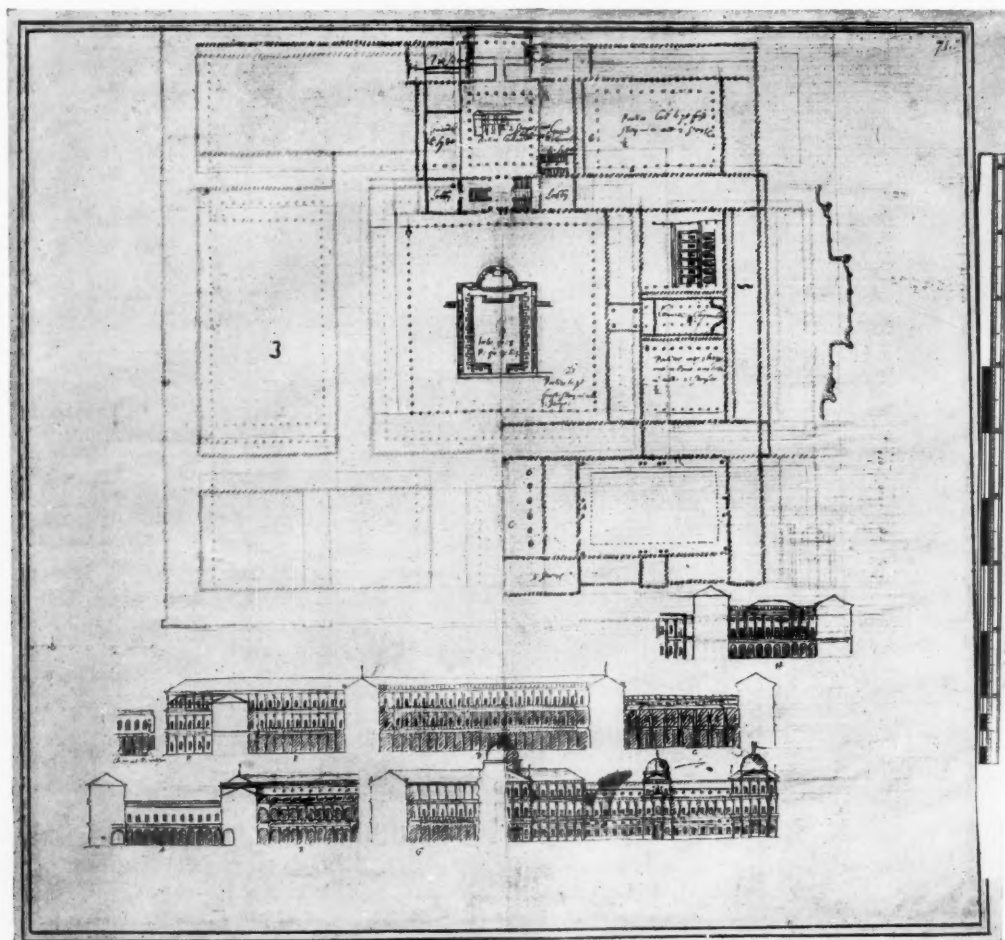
PRELIMINARY SKETCHES FOR THE GROUND-FLOOR PLAN AND ELEVATIONS OF THE CHATSWORTH B. SCHEME, BY WEBB
